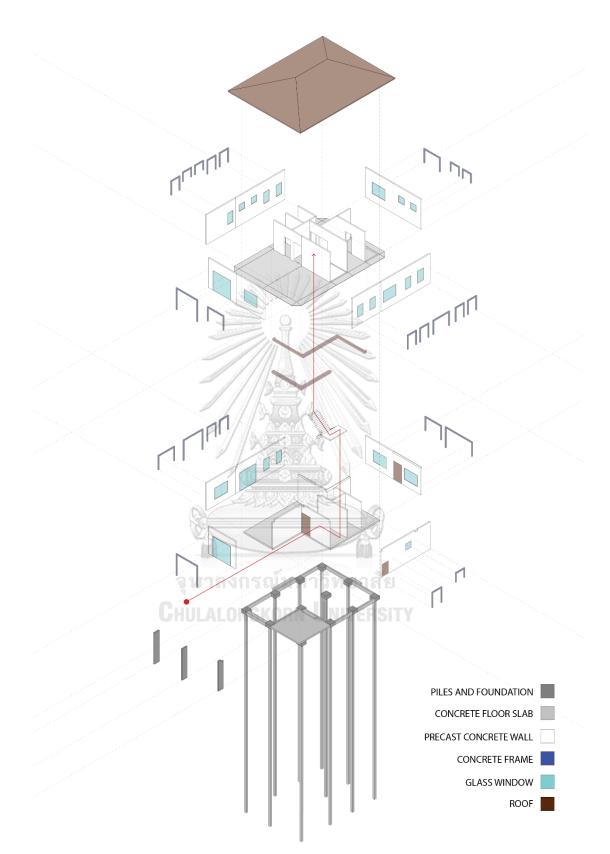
Exploded axonometric of the building components in the proposed A2 units.
